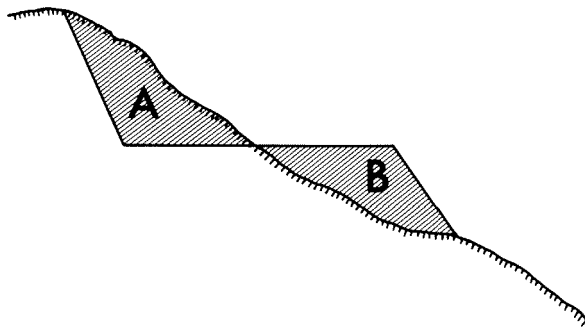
Typical side-hill cross section illustrating how cut material, A, equals fill material, B.
